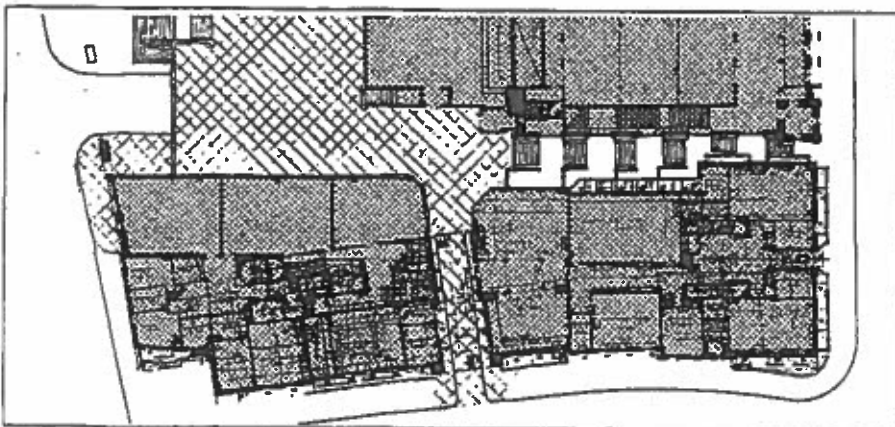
New Metcalf Plaza extending to College St. archway and new Benefit St. alley
